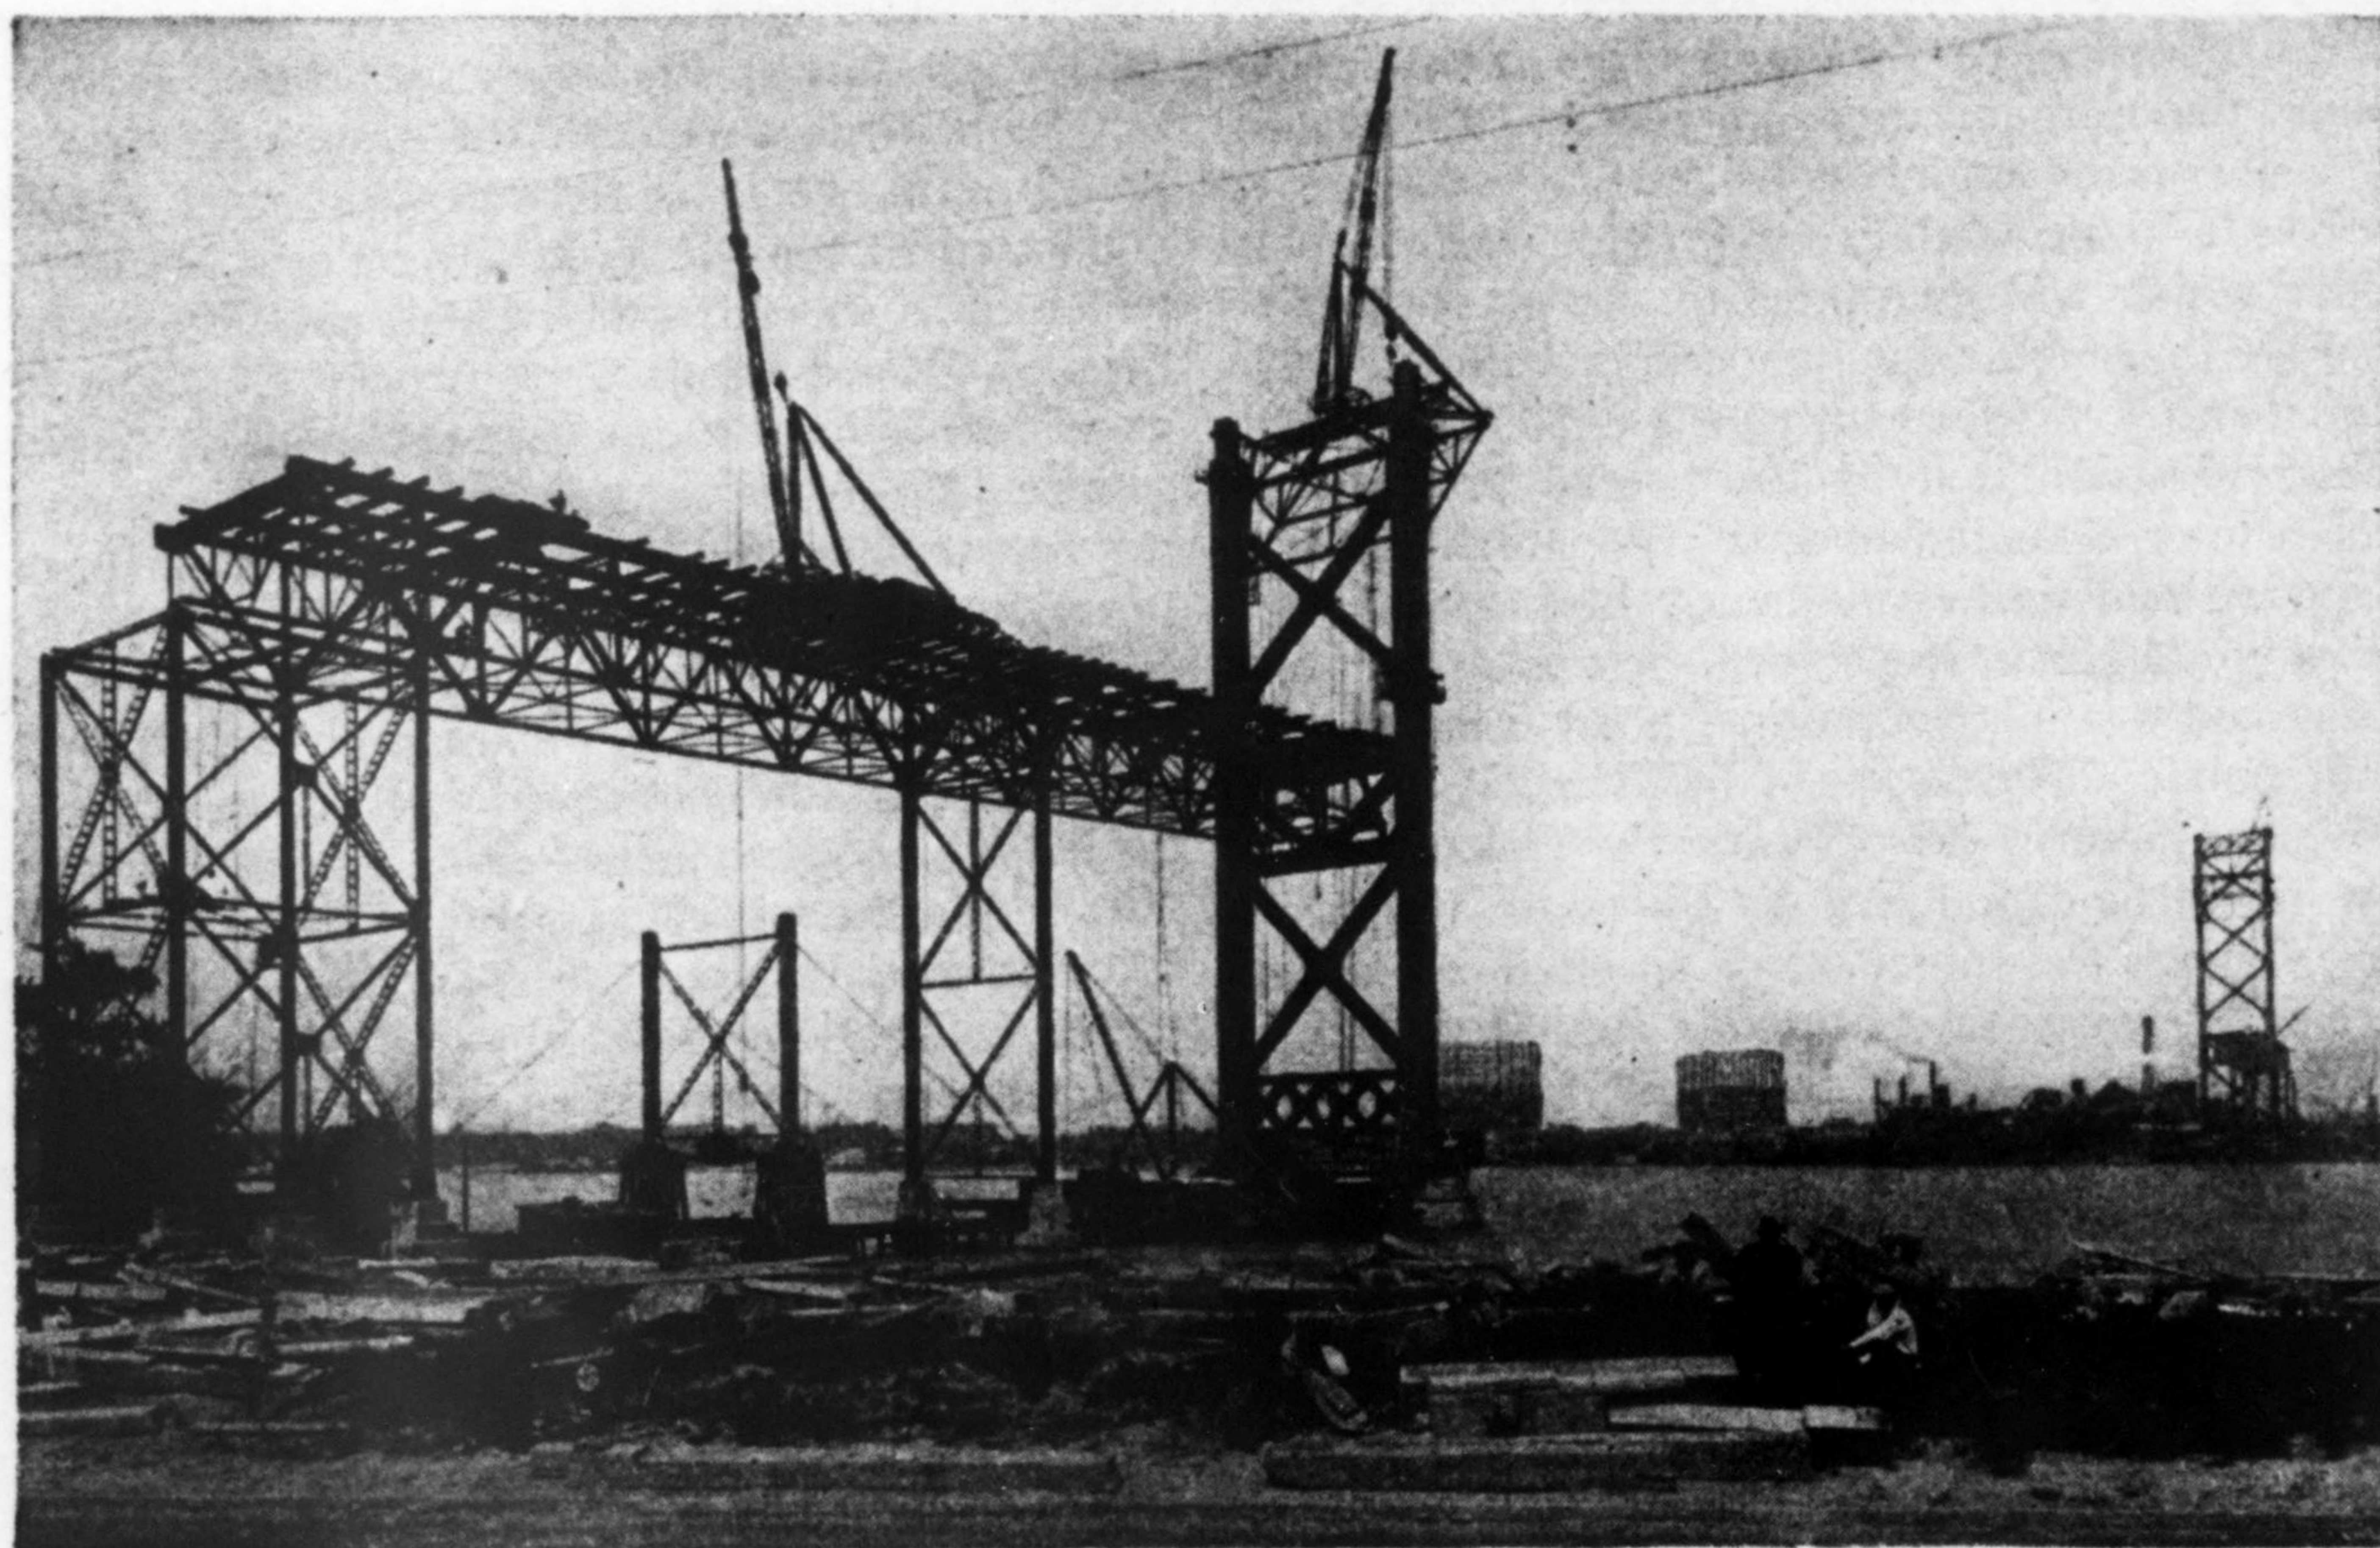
Detroit River Bridge Towers Under Erection. View From Canadian Side.
